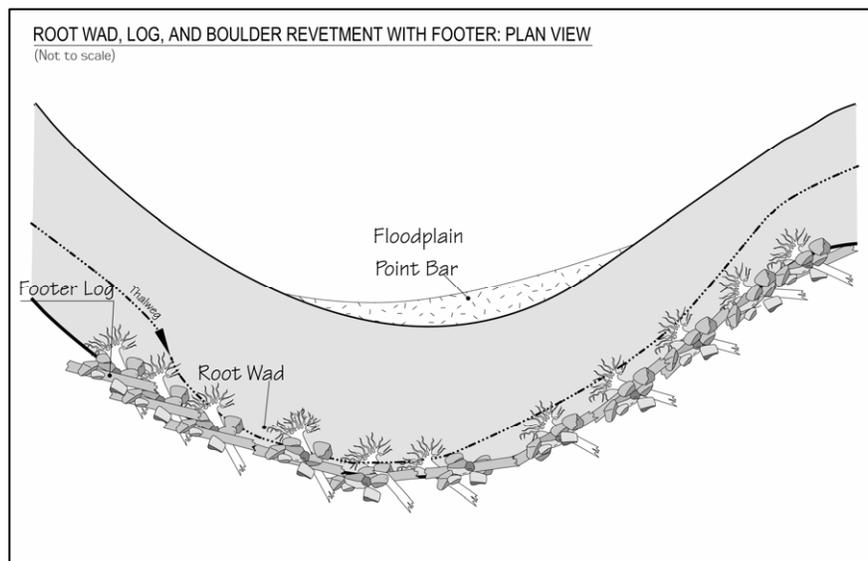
Root Wad, Log, and Boulder Revetment with Footer: Plan View (USDA-FS, 2002)
